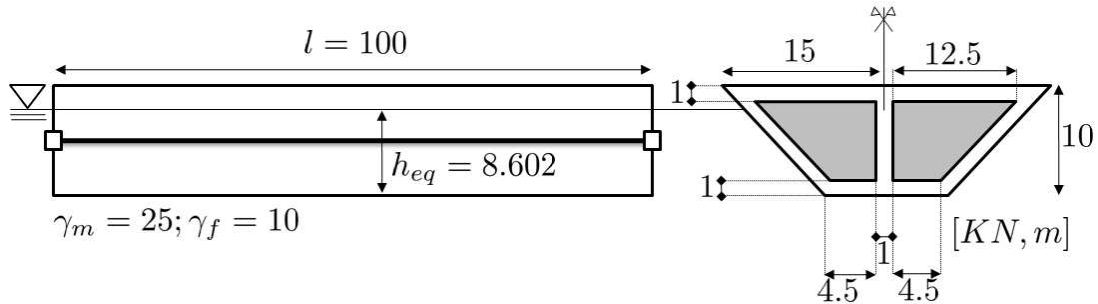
Beam benchmark 2 - Flotability analysis of a beam with a trapezoidal section
